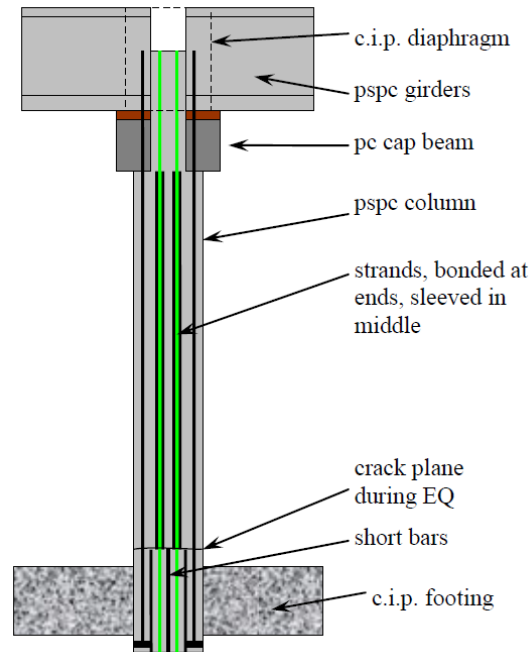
Prestressed precast column concept (Davis et al. 2012)
